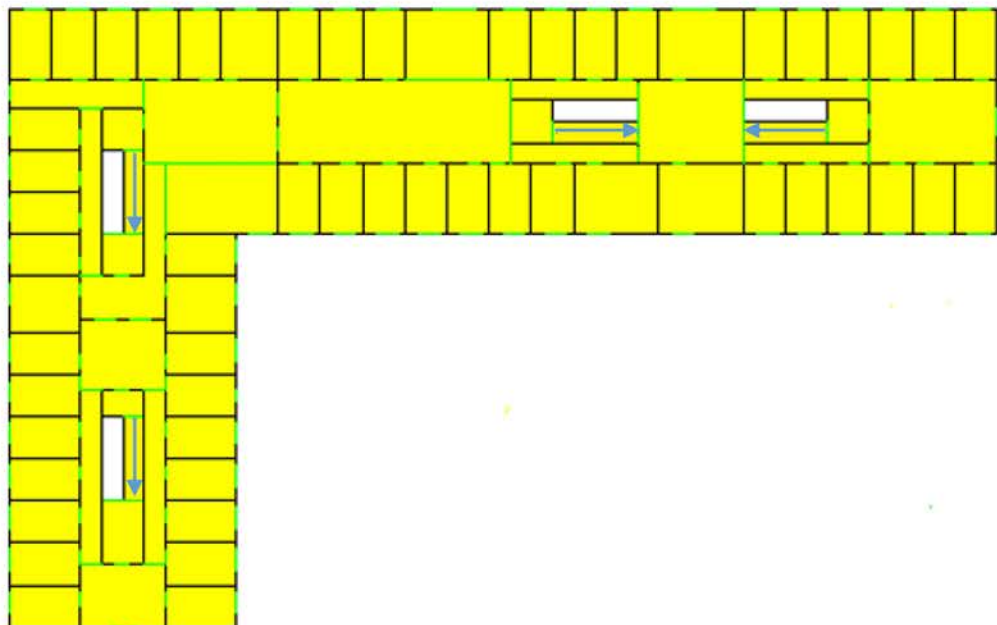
Simplified room layout for 50 George Square 3rd floor
